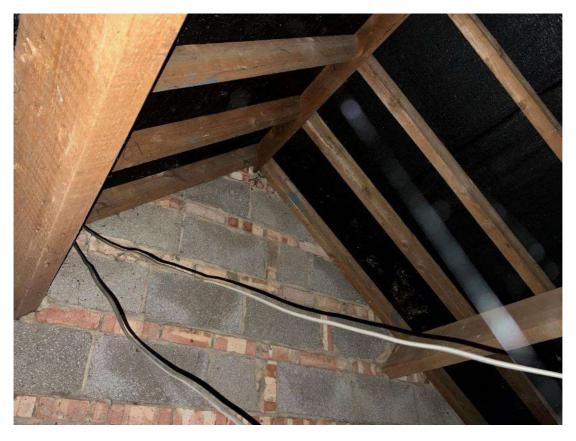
Building 1. Shows modern timber work, block work and roof lined with felt. North end of roof space.
